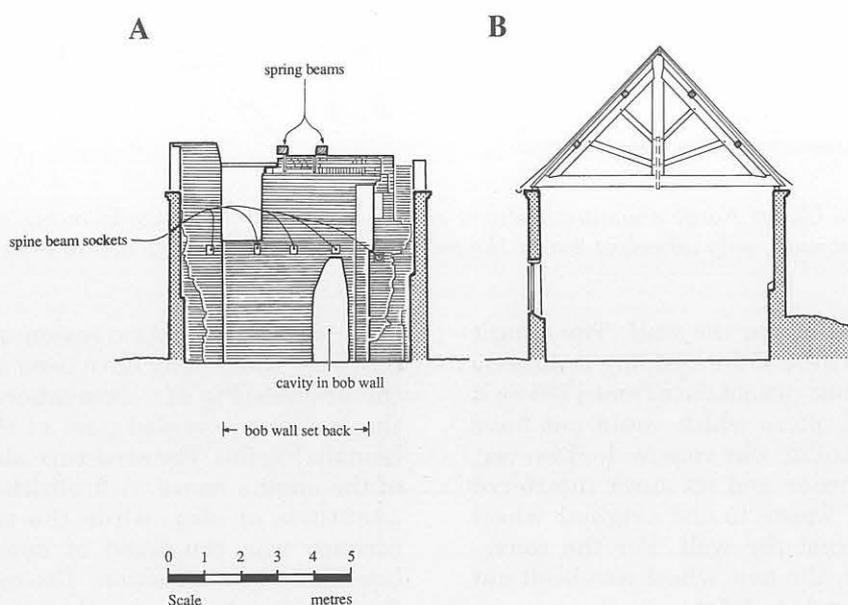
The south elevation of the engine house bob wall (A) and a cross-section of the central range showing a typical roof truss (B). The original upper floor levels in the engine house are denoted by the levels of the spine beams and spring beams.
